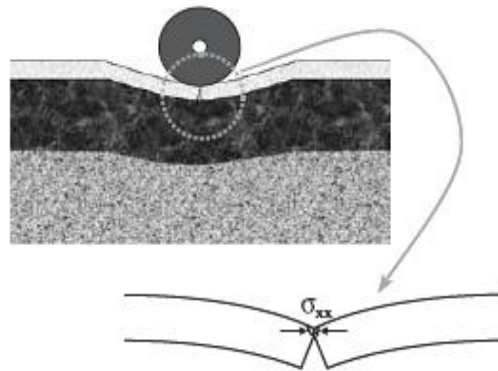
Joint spalling mechanism in ALF UTW slabs. (Rasmussen et al., 2002; Rasmussen and Rozycki, 2004)
